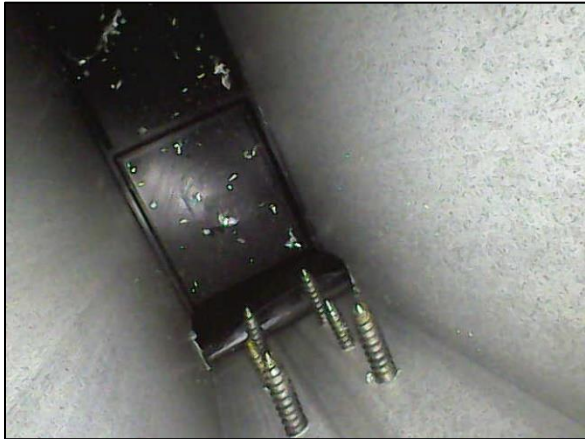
Bottom mullion transom connection and holes drilled for inspection purposes
